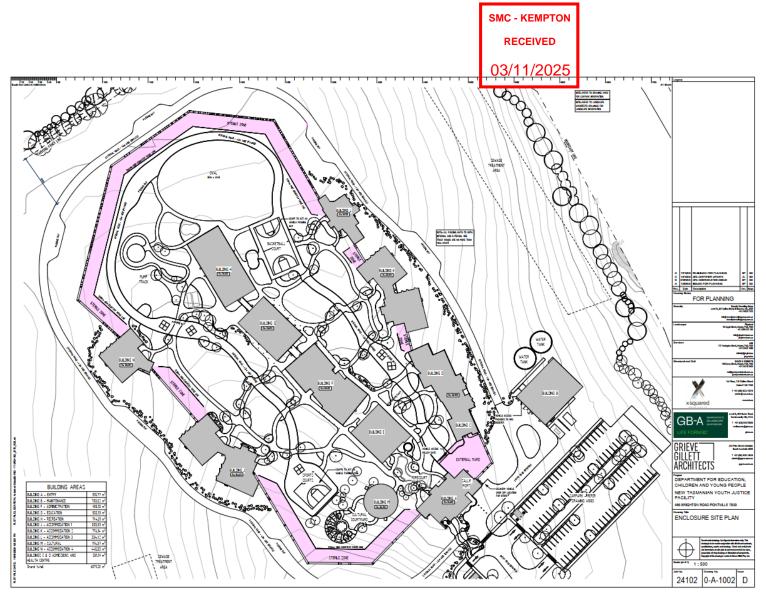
Enclosure site plan. (source Grieve Gillet Architects)
